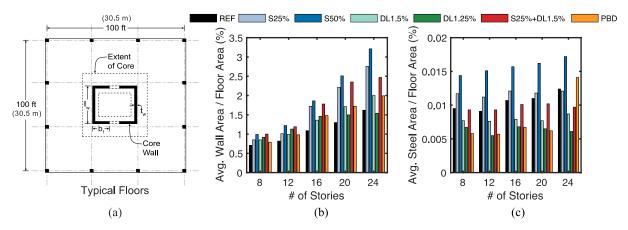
(a) Typical floor plan view, (b) average RC shear wall area as percentage of floor area, and (c) average longitudinal steel reinforcement area as percentage of floor area for different design strategies of 8-to 24-story buildings.
